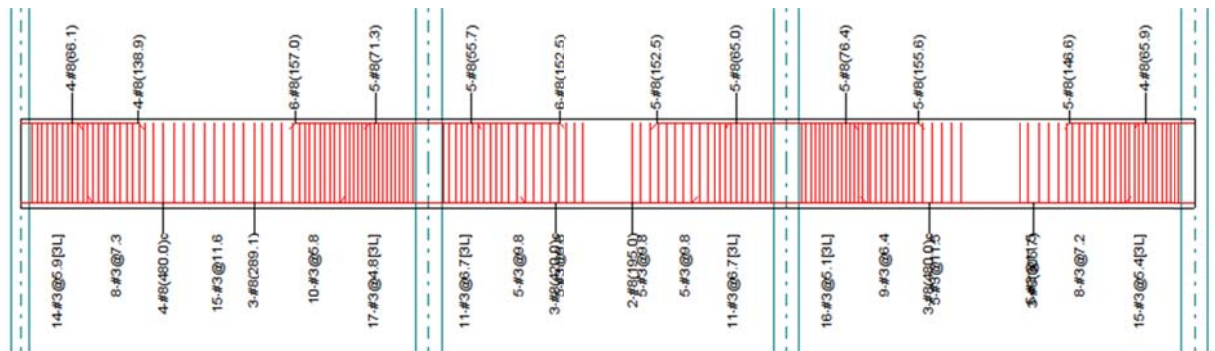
spBeam Column Line G Reinforcing Diagram (Lateral Loads)
